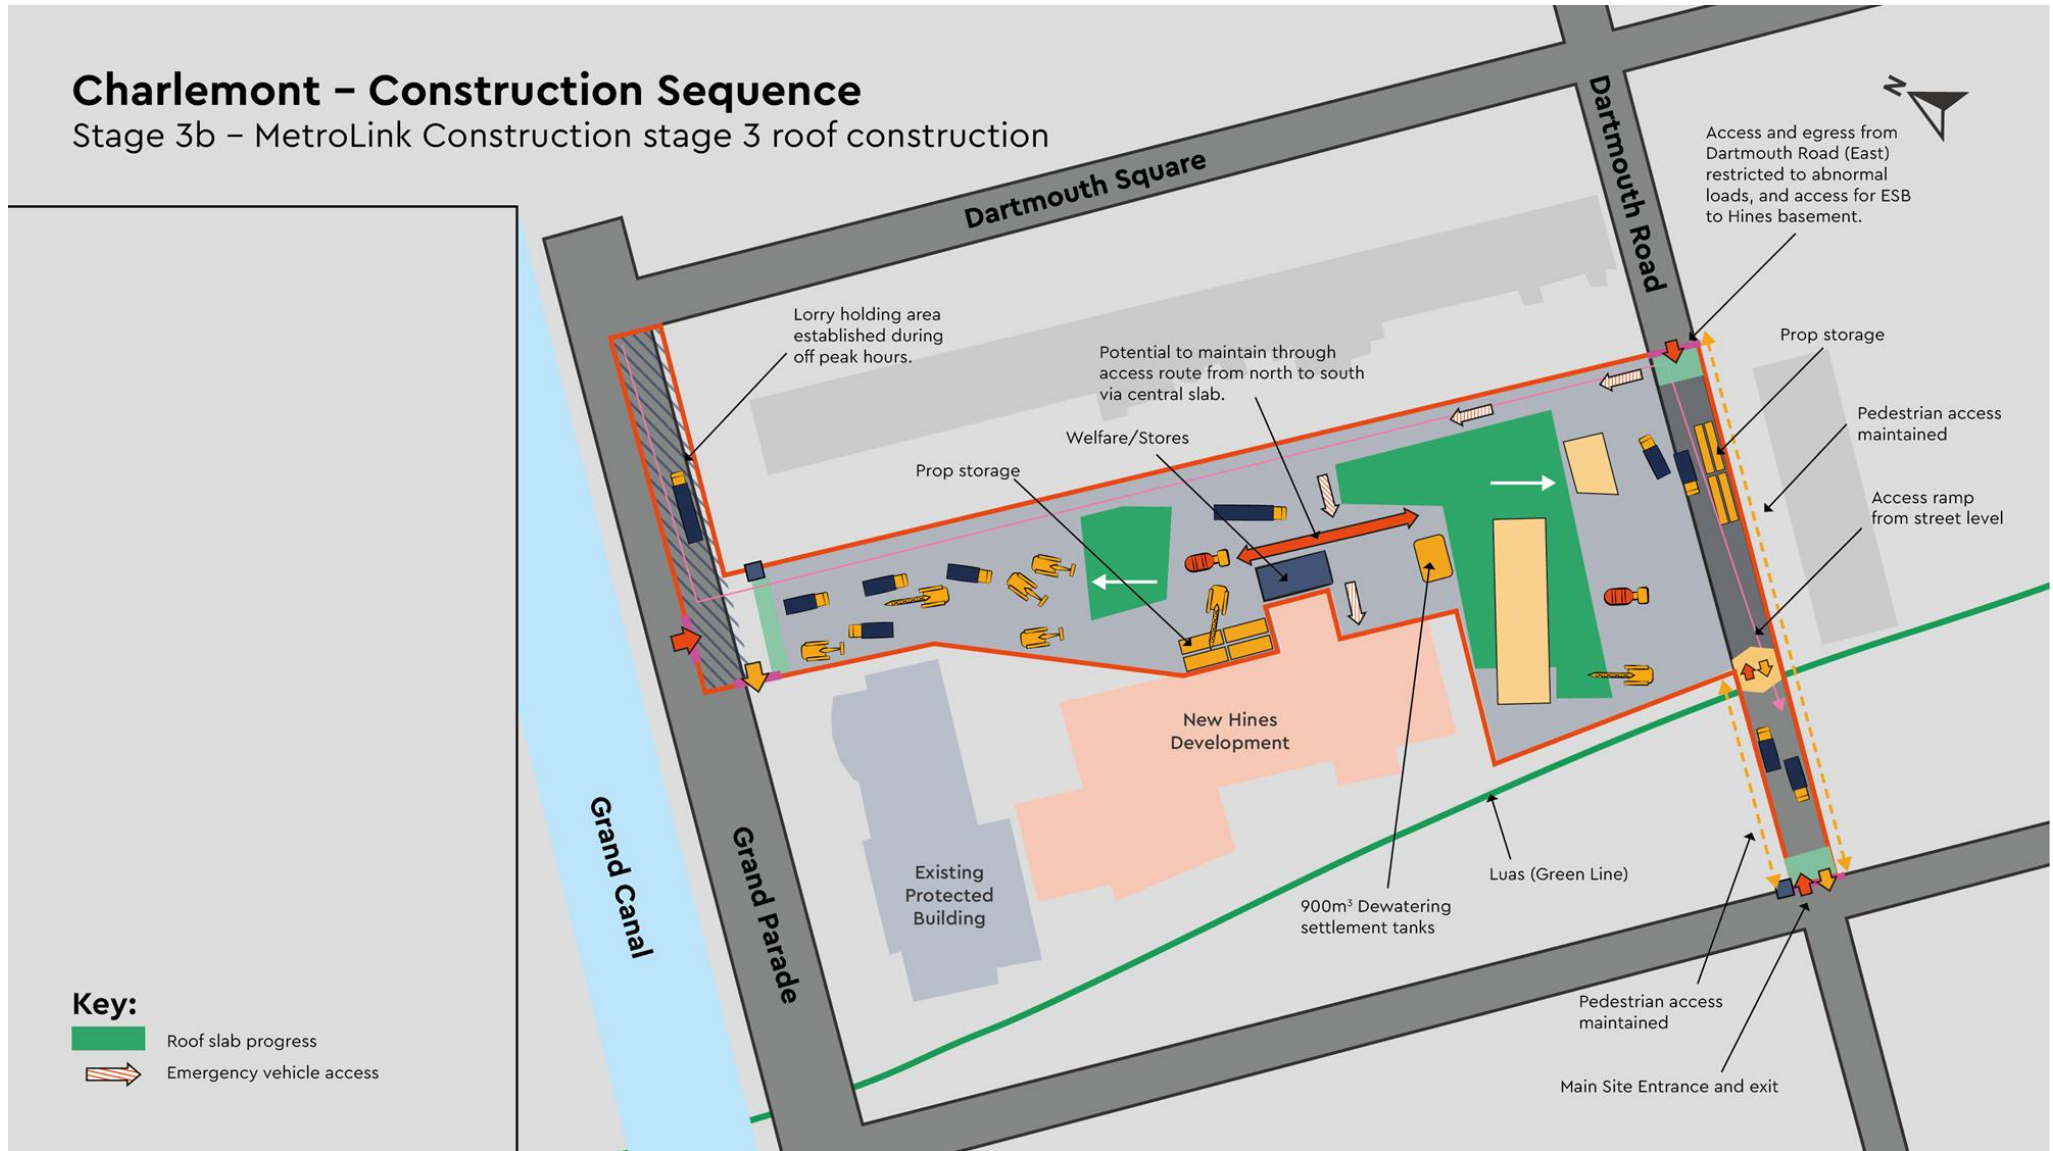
Charlemont Station - Stage 3b Metrolink Construction Stage 3 Roof Construction
